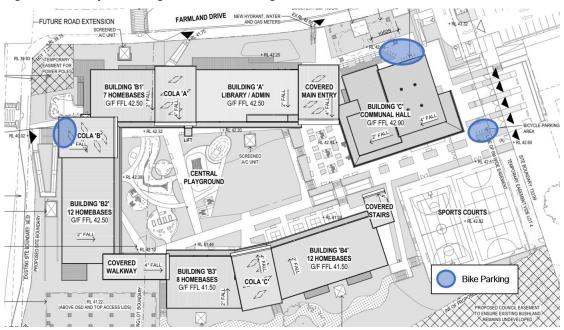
Bicycle Parking Locations at Galungara Public School
